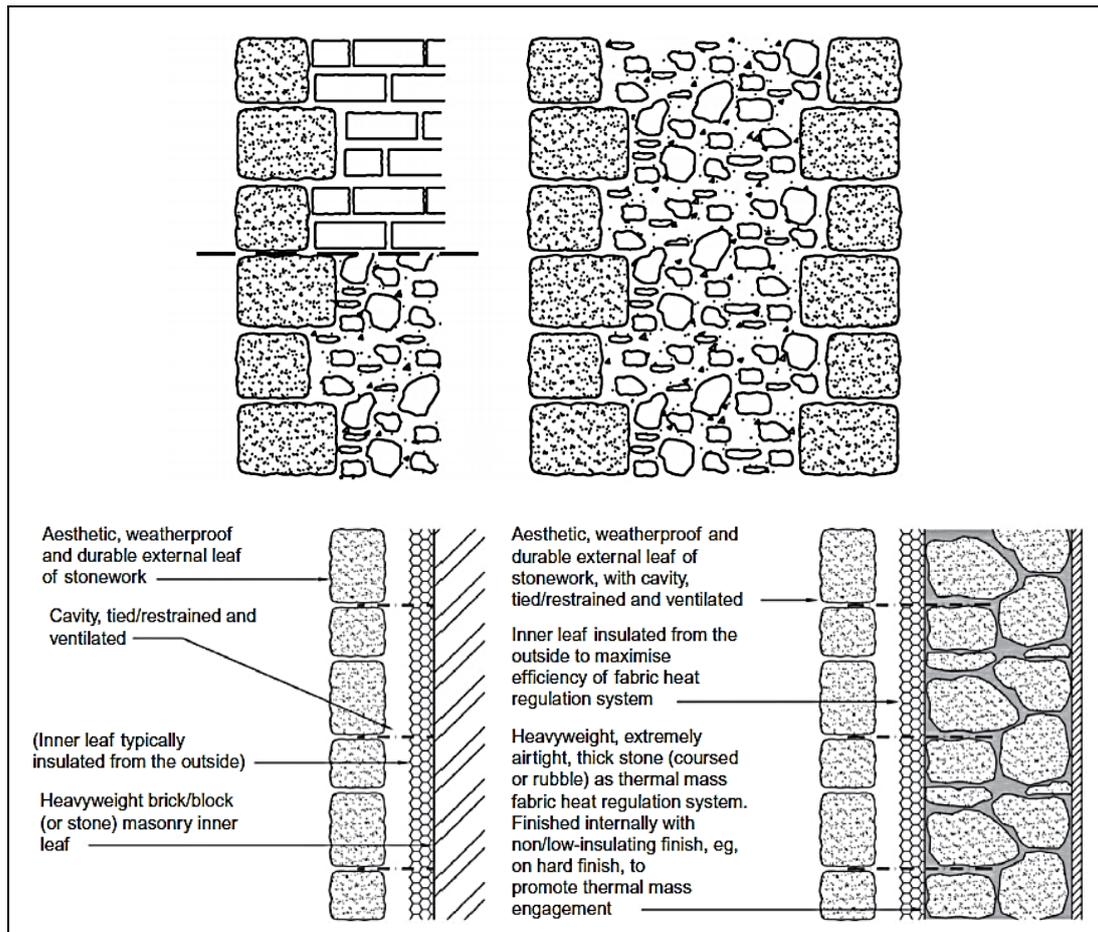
Typical construction configurations of stone masonry in modern and traditional structural contexts [43].
